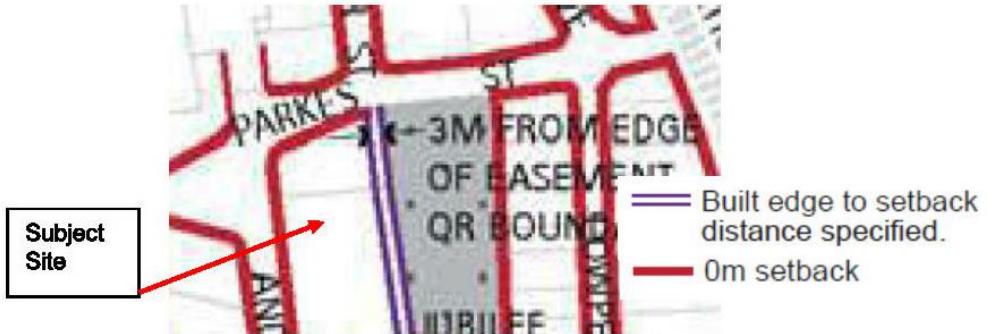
Extract from Section Part 4.3.3.1 'Building Form' of the PDCP, detailing the required building setbacks at the site.
